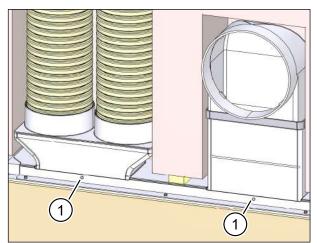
Fixing the connections for flat ductwork / flexible pipe to the wall box
